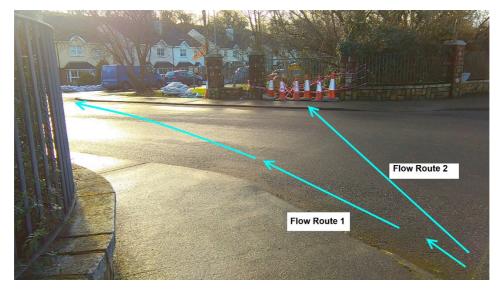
Flow Route 1 ramp blockage and demolished bridge parapet wall
